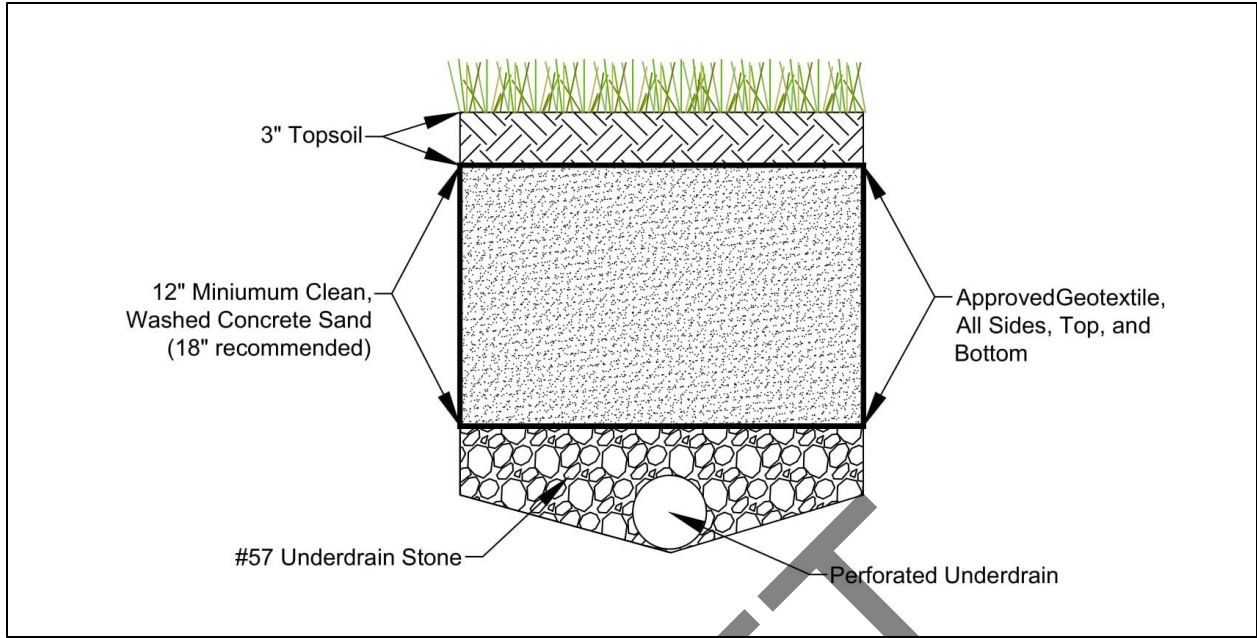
Typical schematic for a nonstructural or surface sand filter.
